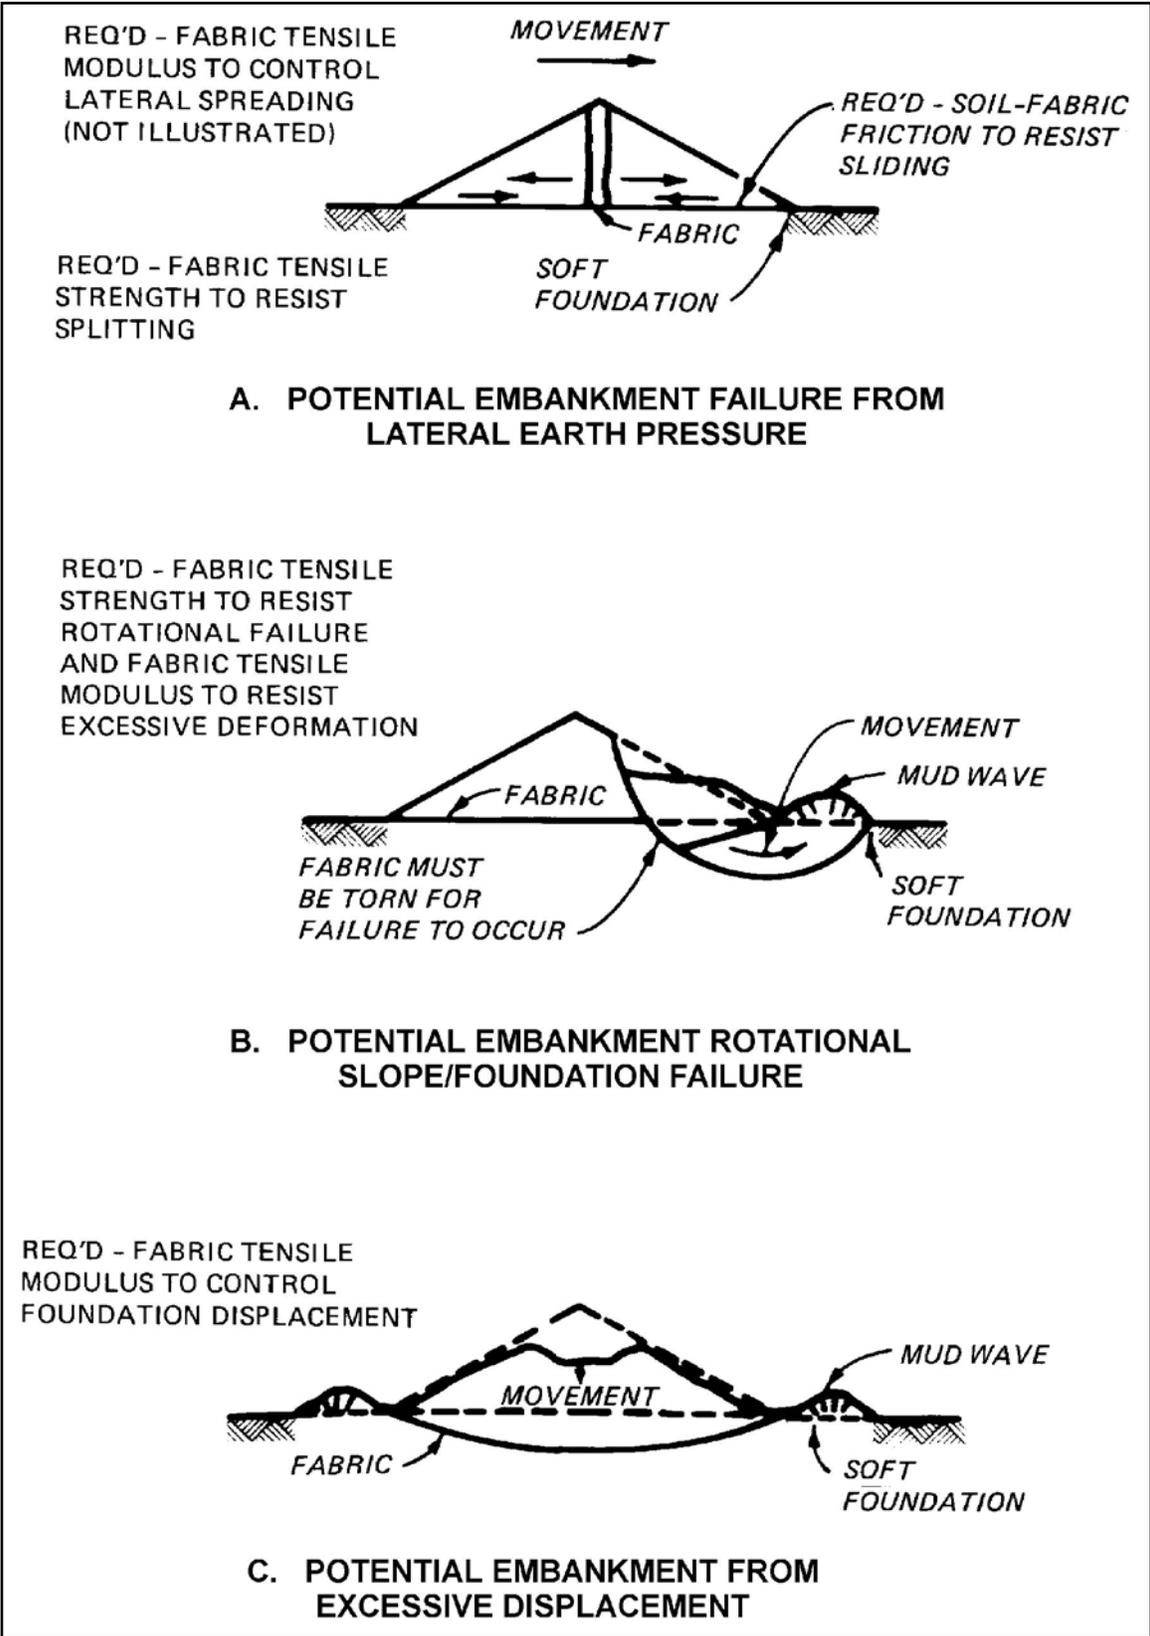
Potential Fabric-Reinforced Embankment Failure Modes
